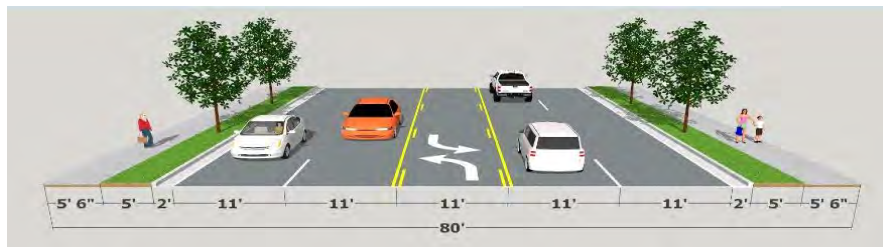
5/4 Lane Alternative A –Buffered Sidewalk (14th Street to 12th Street)
